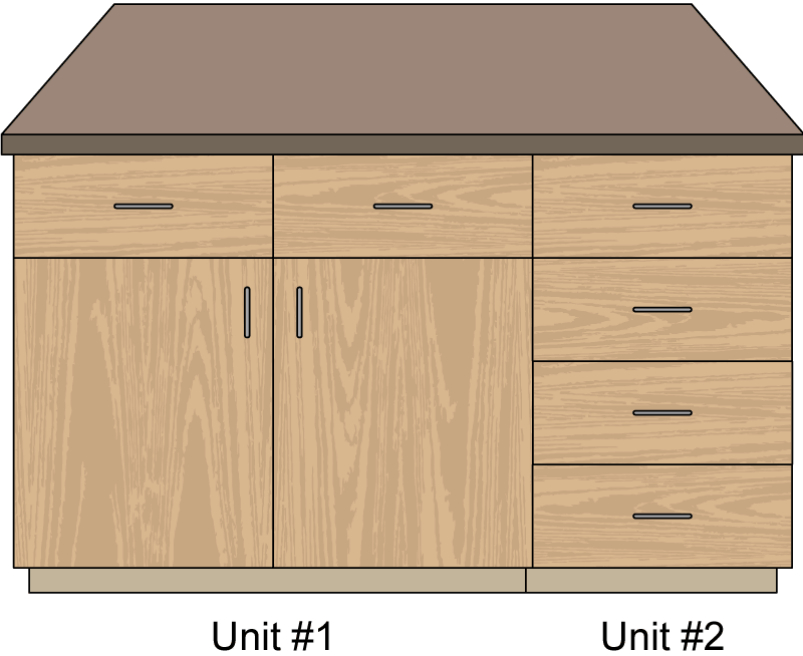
Grain Layout, Flush Panel, Horizontal Drawer Fronts
